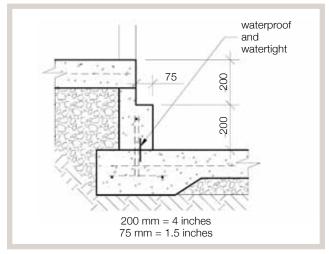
Foundation designed to be watertight (dimensions metric).
